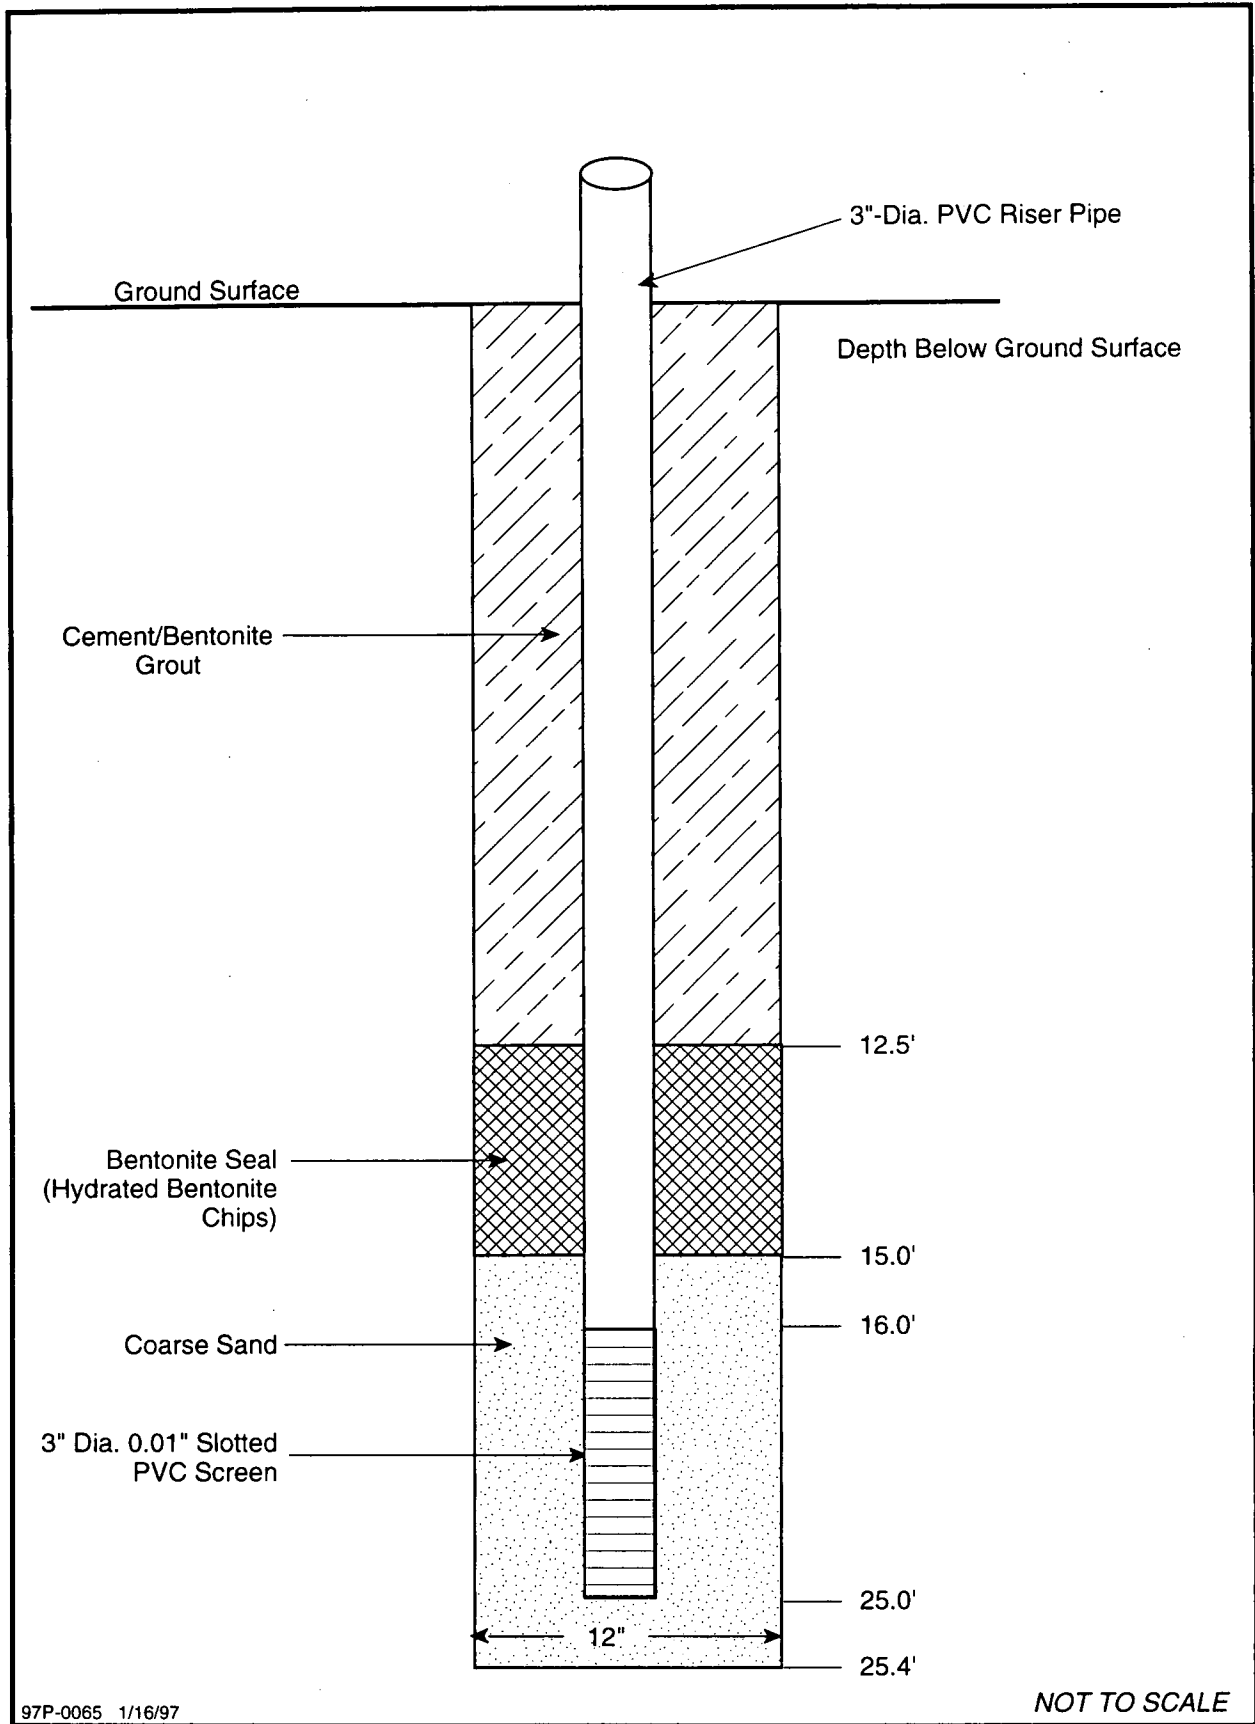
CONSTRUCTION DETAILS OF EXTRACTION VENT AT TANK FARM 2
